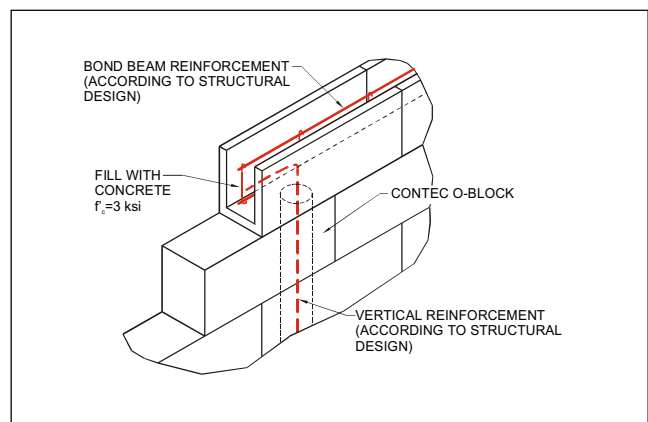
Bond beam at top of the wall using Contec U-Block.
